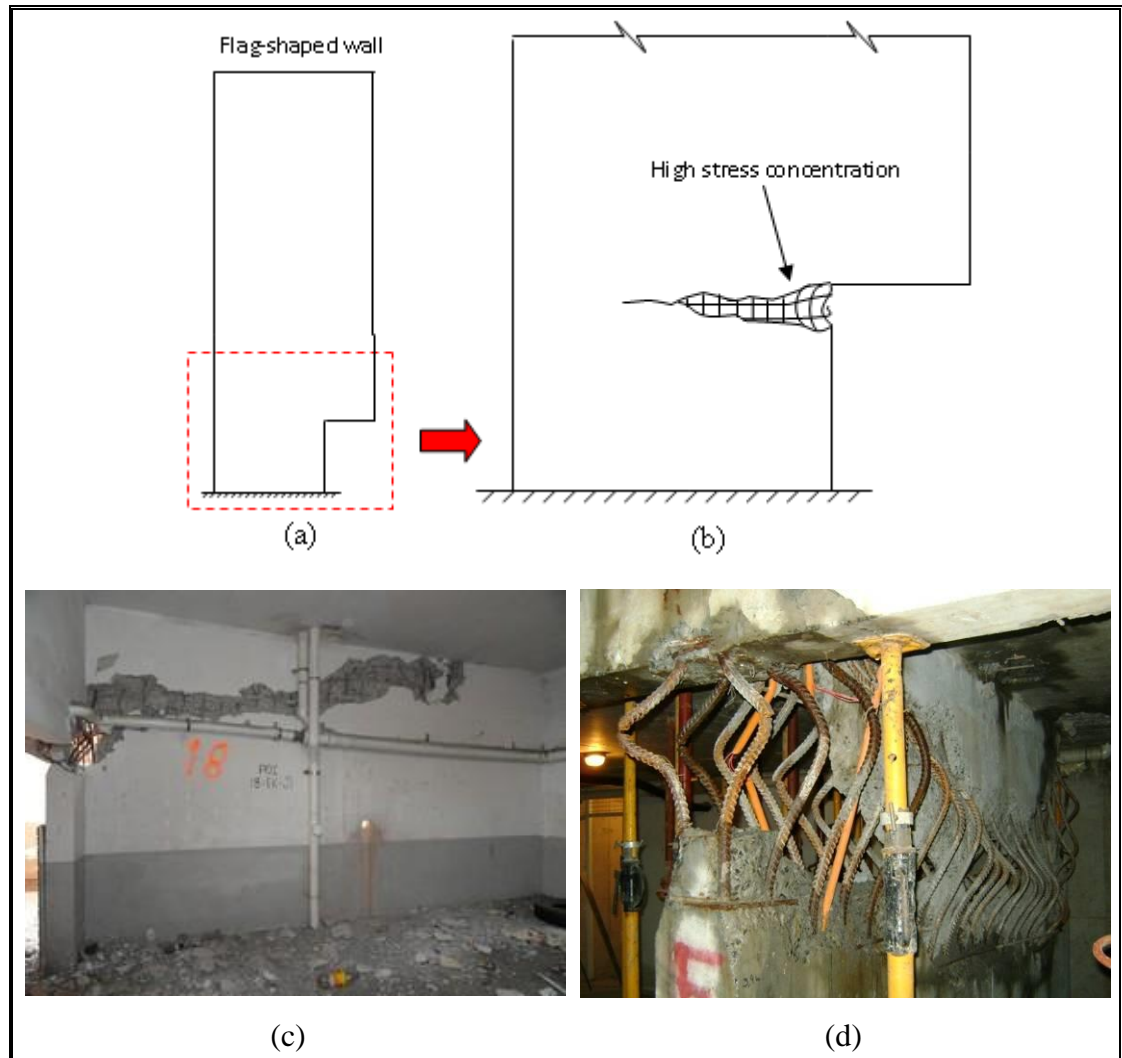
(a) Typical flag-shaped wall; (b) damage observed in flag shaped walls;
